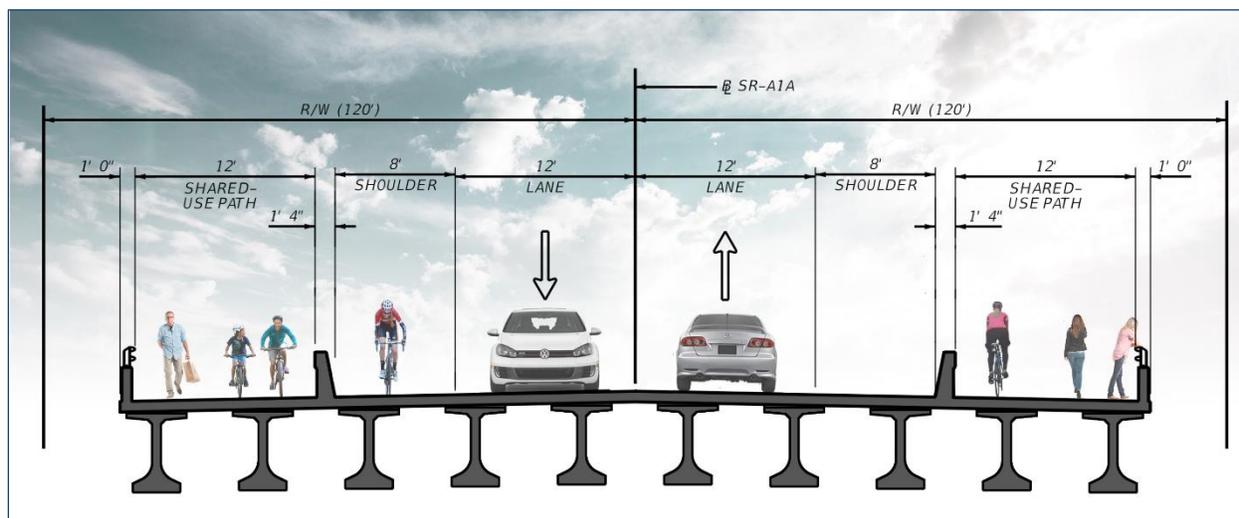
PROPOSED BRIDGE TYPICAL SECTION
